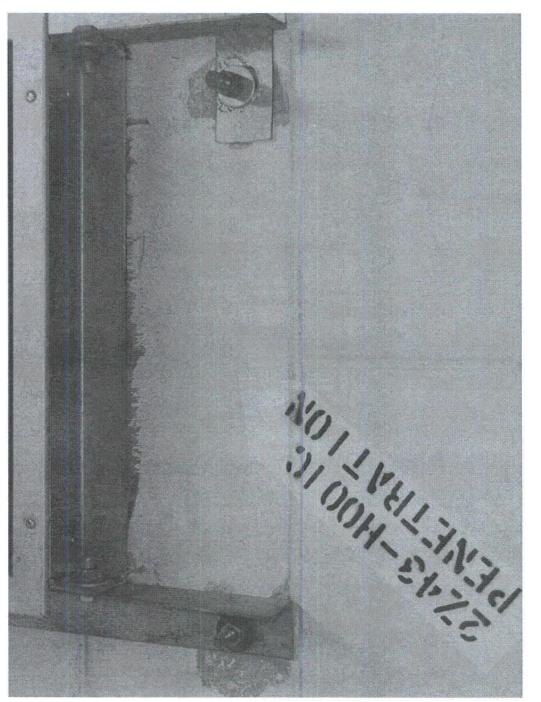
Spalling at HVAC Support (TC-T12 Control 112)
